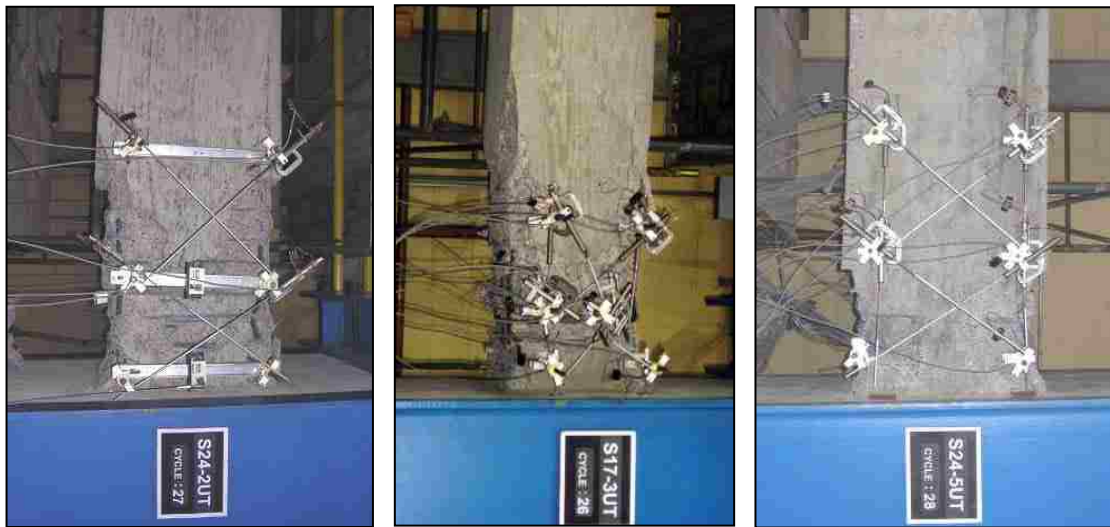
, 3.45, and 3.46 Concrete spalling exposing longitudinal steel: earthquake damage (PEER)
